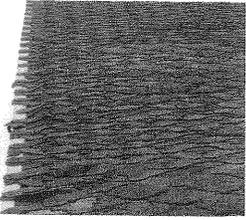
Close up of the roof on back of church facing Hogans Alley. Damaged and or missing shingles and damaged flashing.
